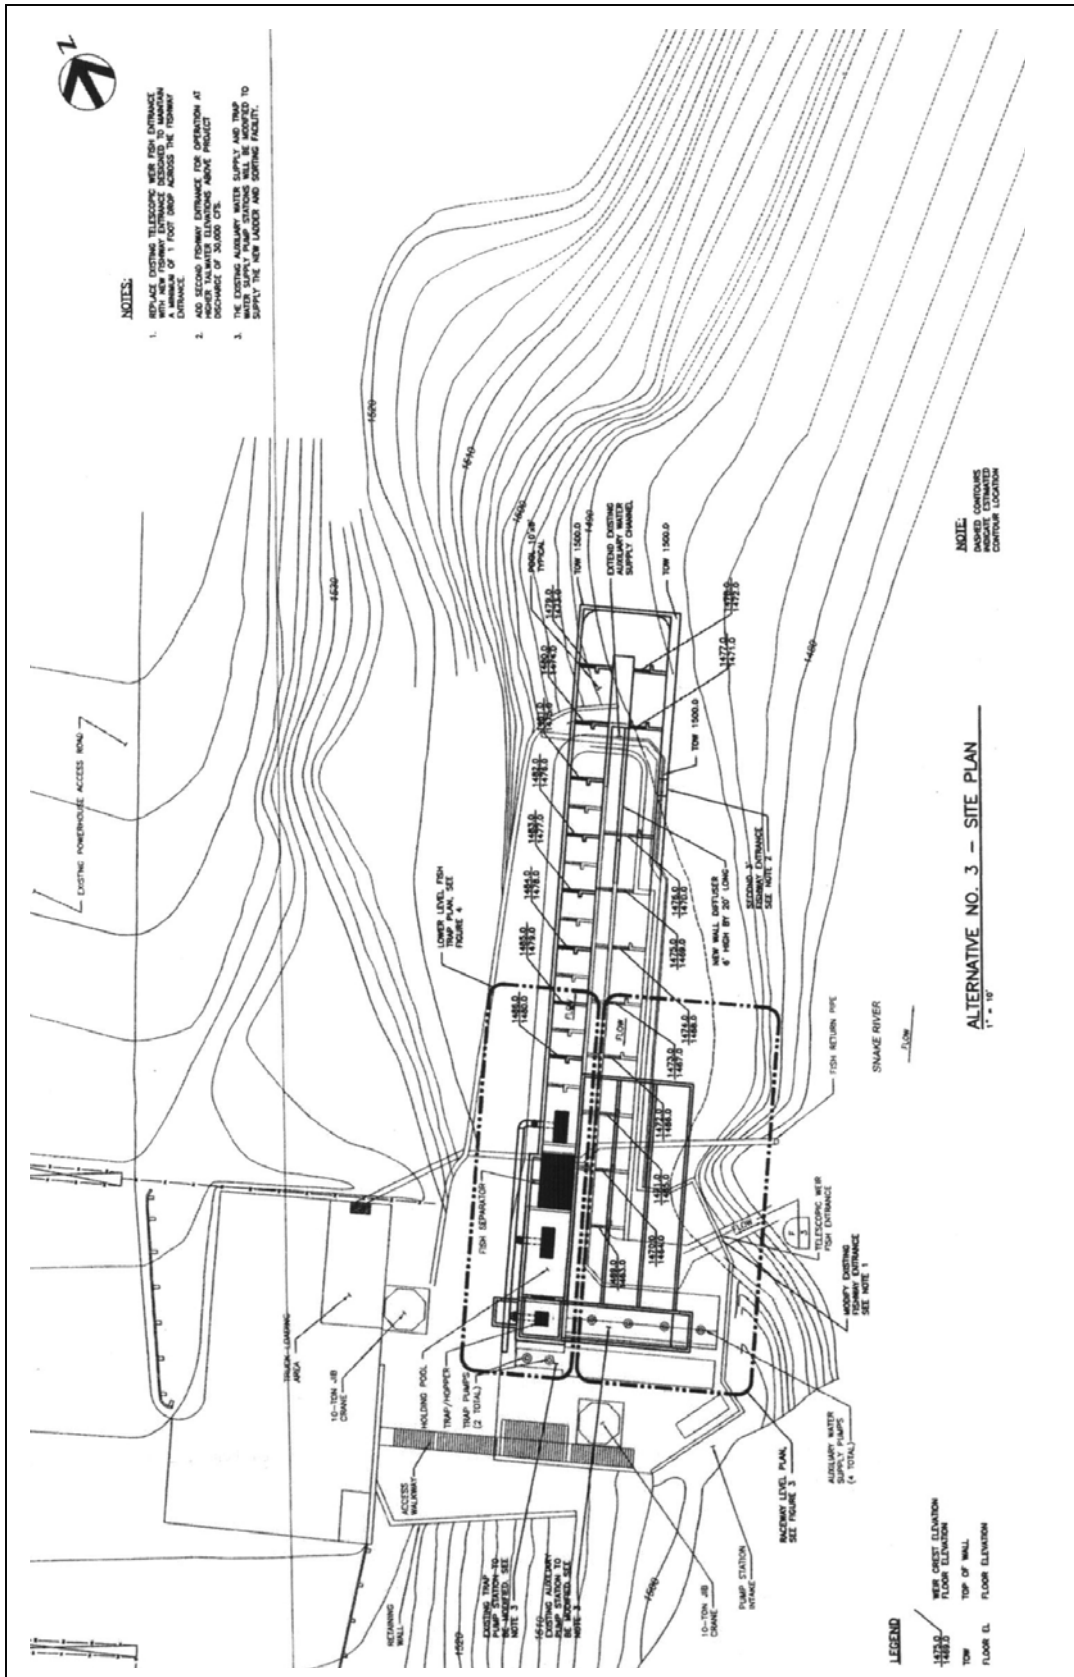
Plan view of Hells Canyon trap modification Alternative 3 revised.
